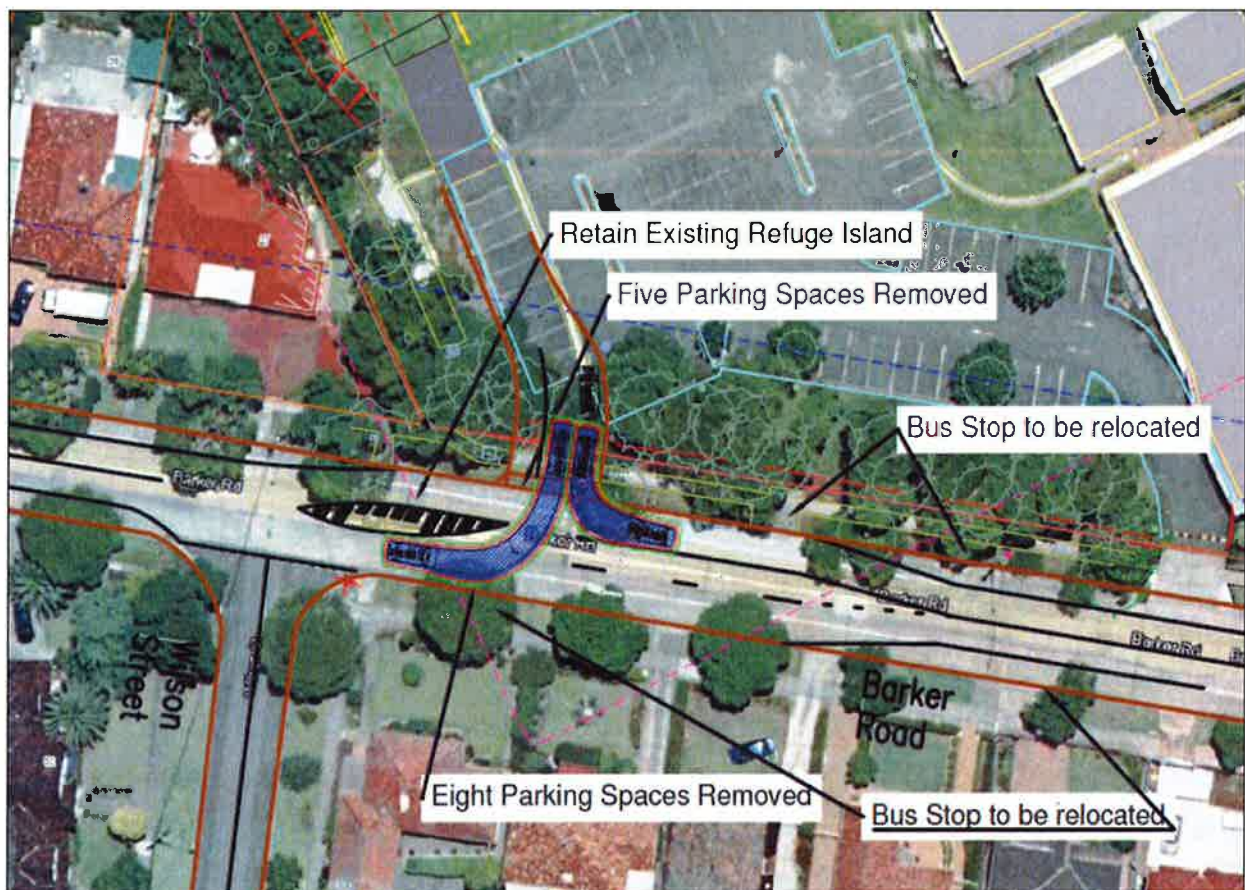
Proposed road works as a result of new access to Precinct 3 and underground car park (Source: Proponent's PPR / RtS)
